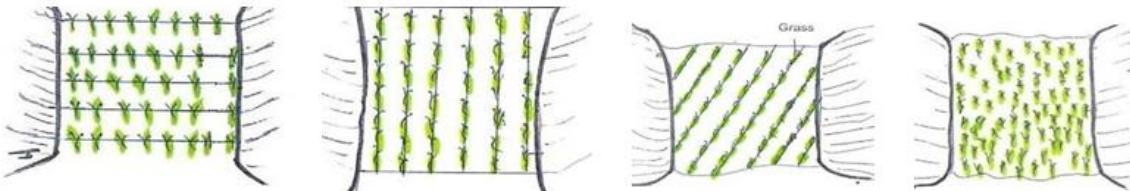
Grass Planting Types (Source: Road side Bio-engineering , Site Hand Book, John Howell)
